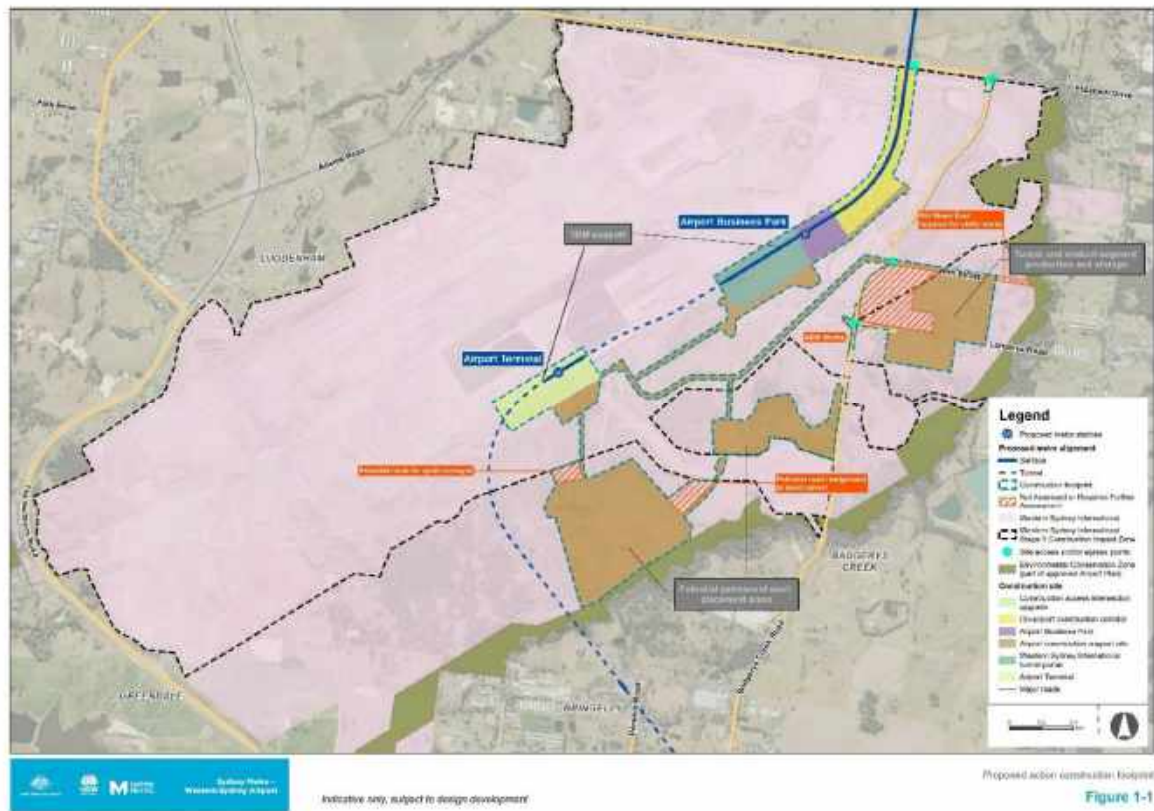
On-Airport Site Layout (Rail Construction Impact Zone)
